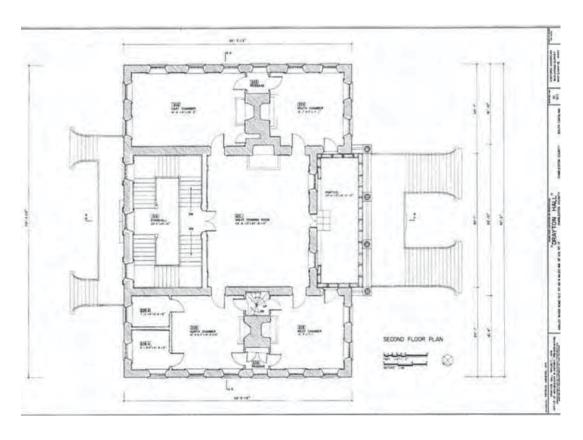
Second Floor Plan, Drayton Hall, HABS, SC 377 (1973)
